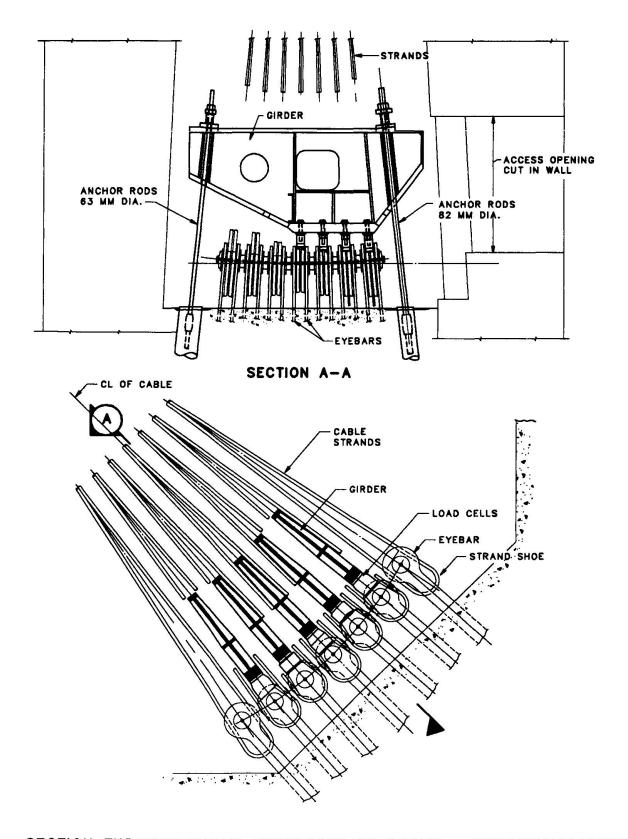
Reanchoring Scheme for Main Cable on Manhattan Bridge
